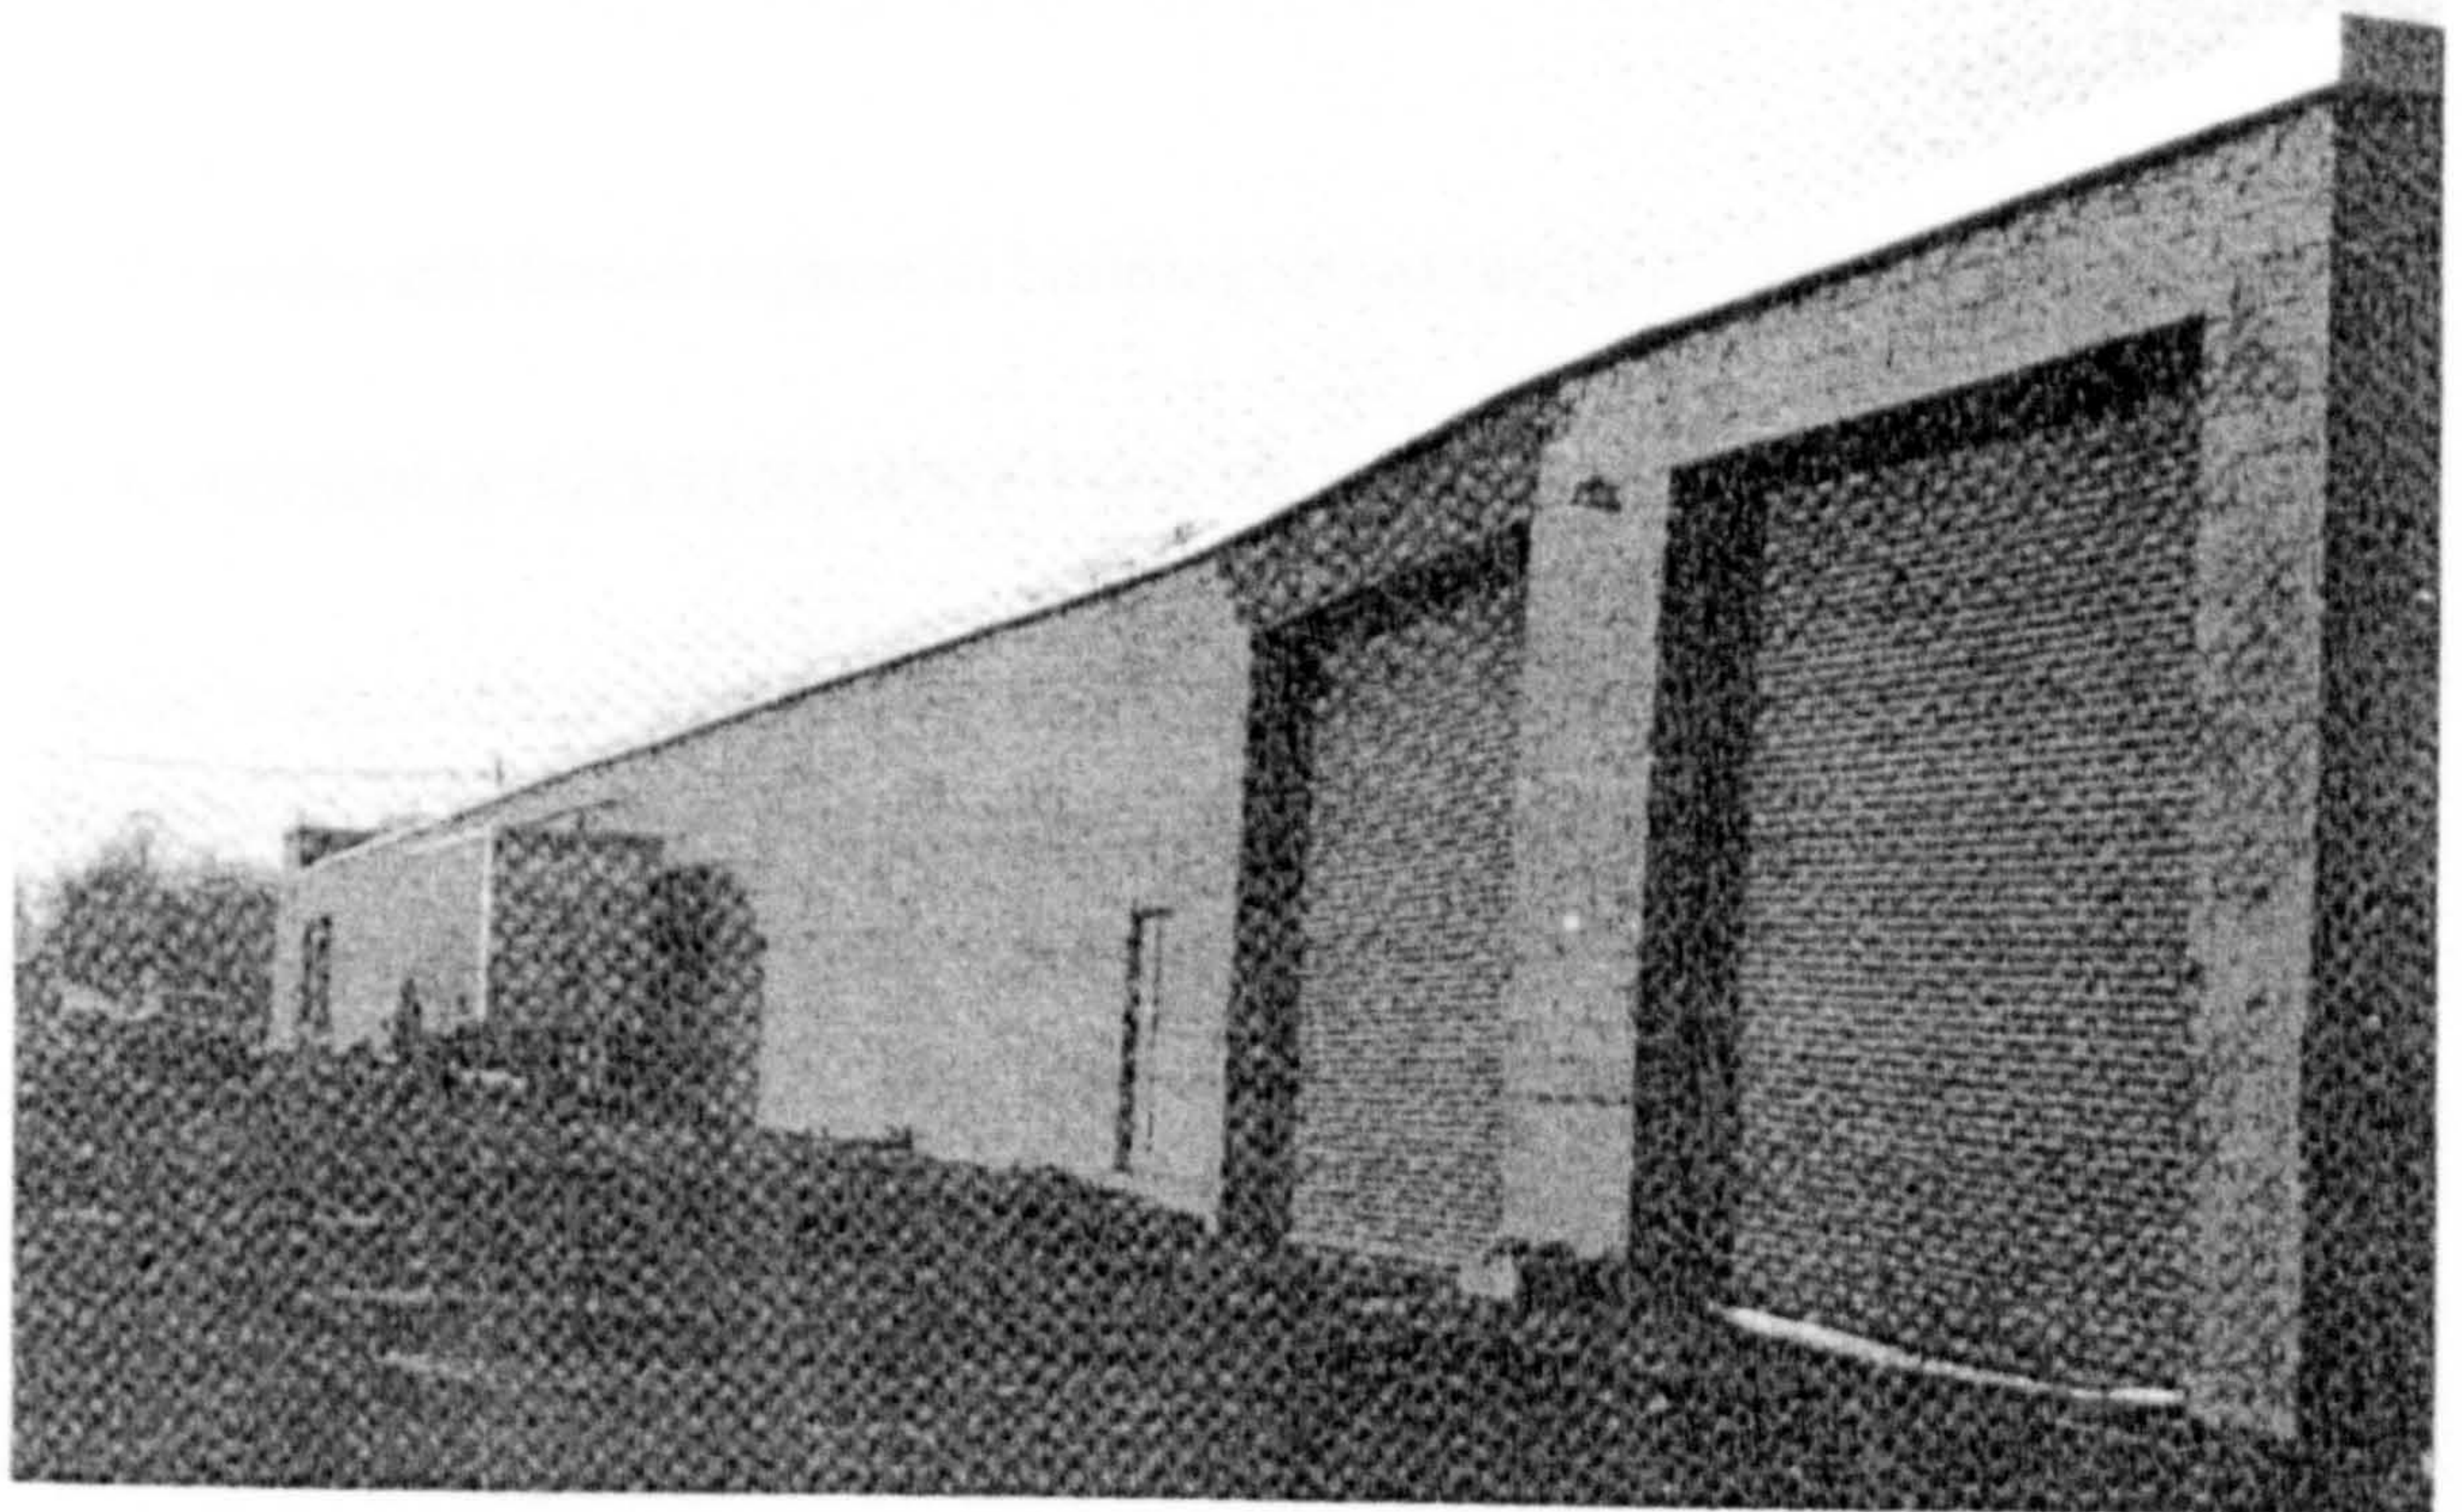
Differential settlement apparent along wall of warehouse, Queens, New York, 1960, (Hunt, 1986)
